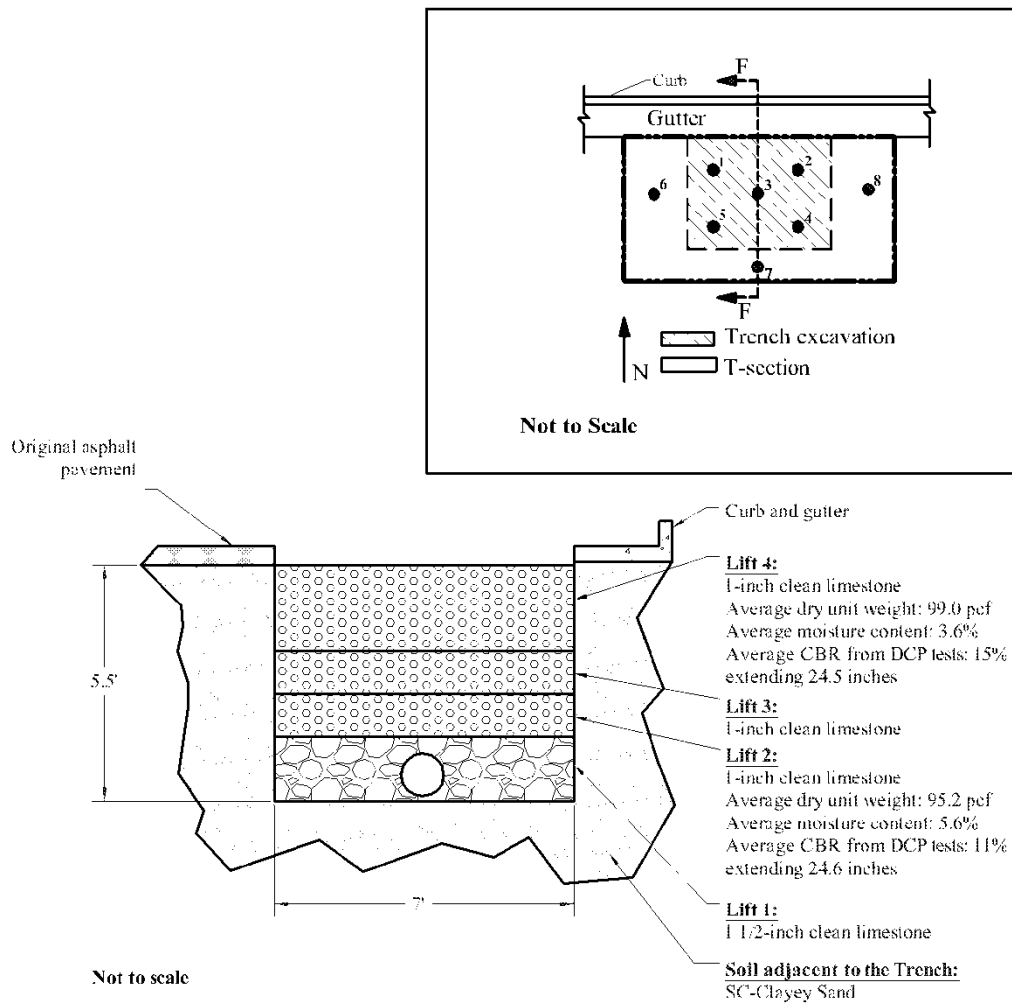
Cross-section of Trench F on July 12, 2007; (a) plan view, (b) cross-section
